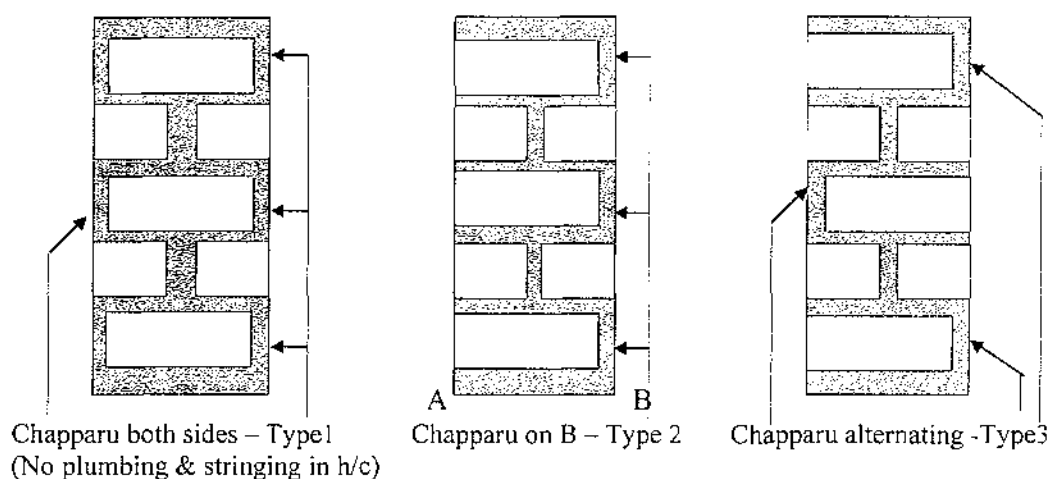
Elevation of a single brick thick wall in English bond with 'Chapparu'
